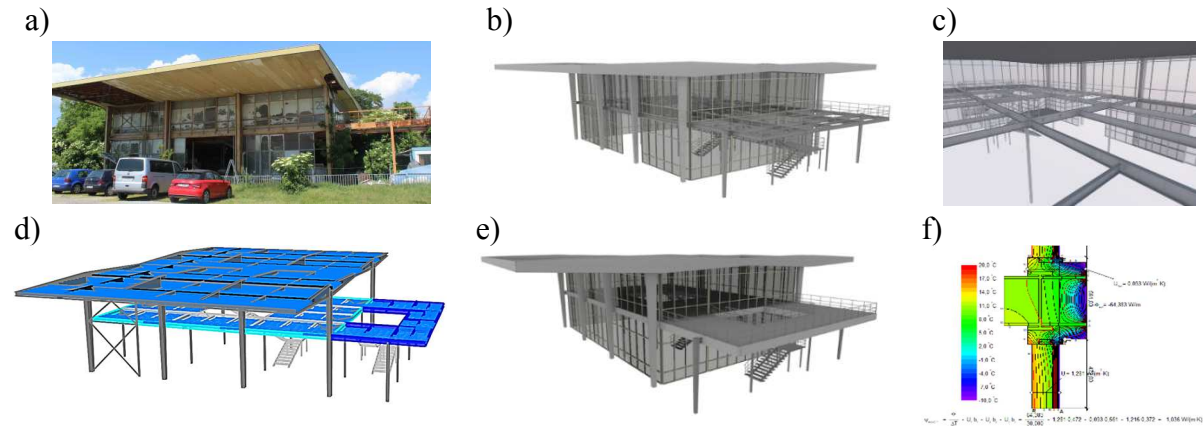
Deep renovation project for model testing [17]. a) Analyzed building, b) as-built BIM input - exterior, c) as-built BIM input - interior, d) numerical model for structural bearing analysis, e) BIM of renovation design and f) numerical thermal bridge analysis.
